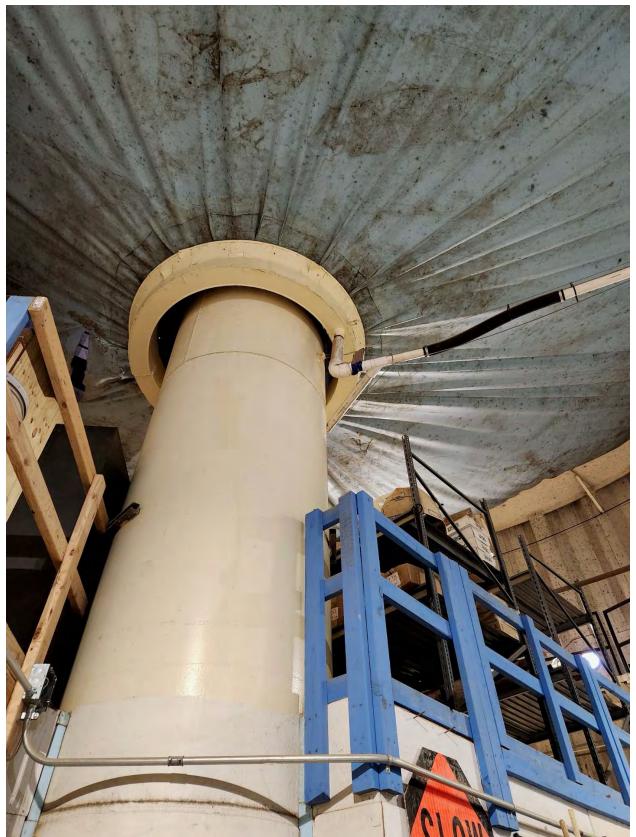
Existing Interior Condensation Collection System and Interior Dry Wet Riser / Inlet/Outlet Pipe
